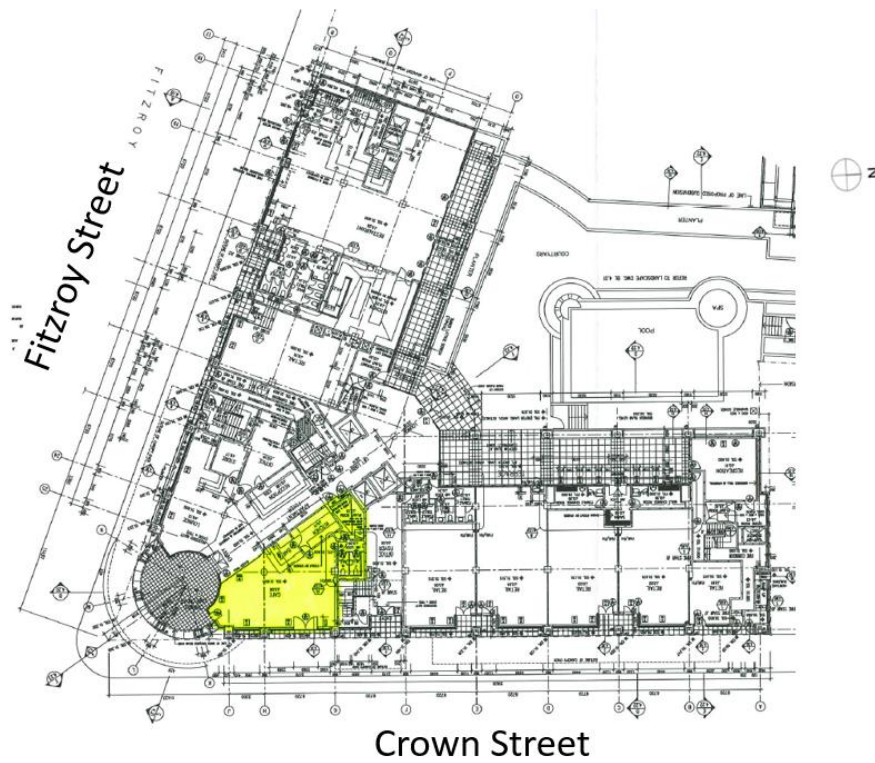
Site floor plan showing subject premises (shaded yellow) and adjoining premises on Crown Street (Source: DA file for D/2018/1149)
